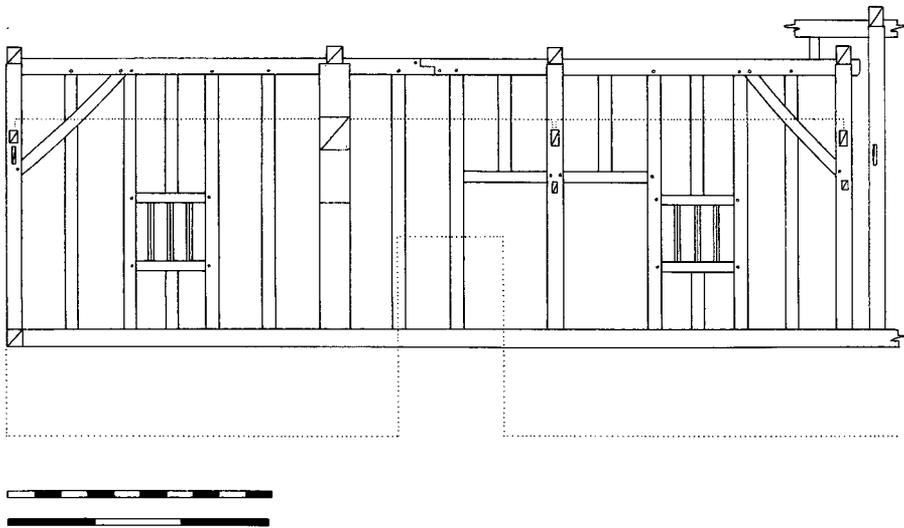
Stonham Aspal, Chevers Farm. Internal western elevation of the 16th-century stable, showing the two original doors with the remains of a jettied courtyard gateway to the right. Scales in feet (top) and metres.
